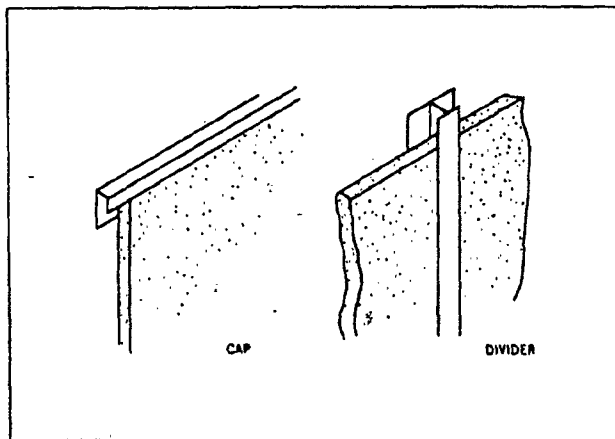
MOULDINGS - To prevent "drumming", add face nailing or adhesive to these mouldings.
